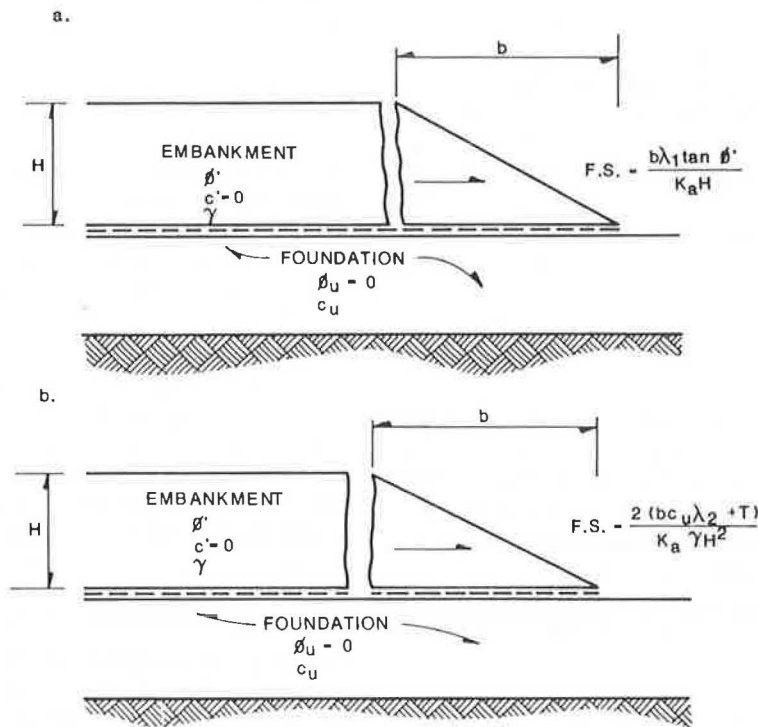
Lateral sliding of embankment: (a) embankment sliding over reinforcement; (b) reinforcement tensile rupture and embankment sliding over foundation soil.
